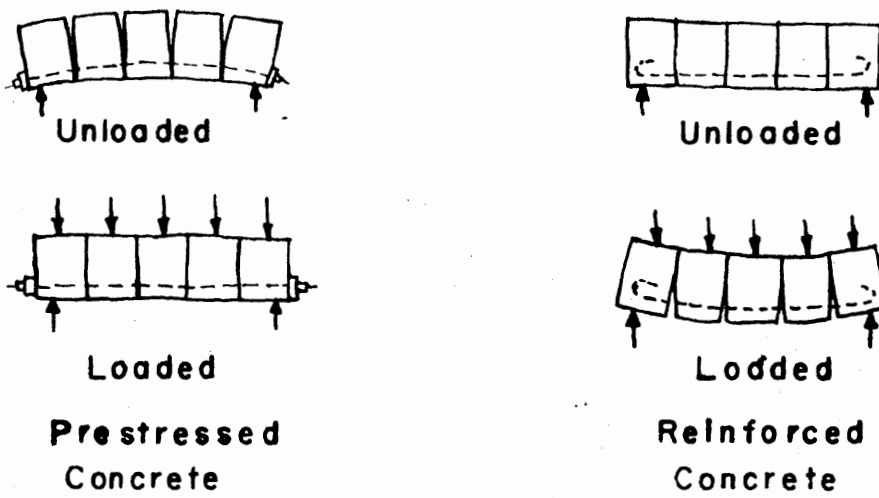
Showing Difference Between Prestressed and Reinforced Concrete Under Load.
